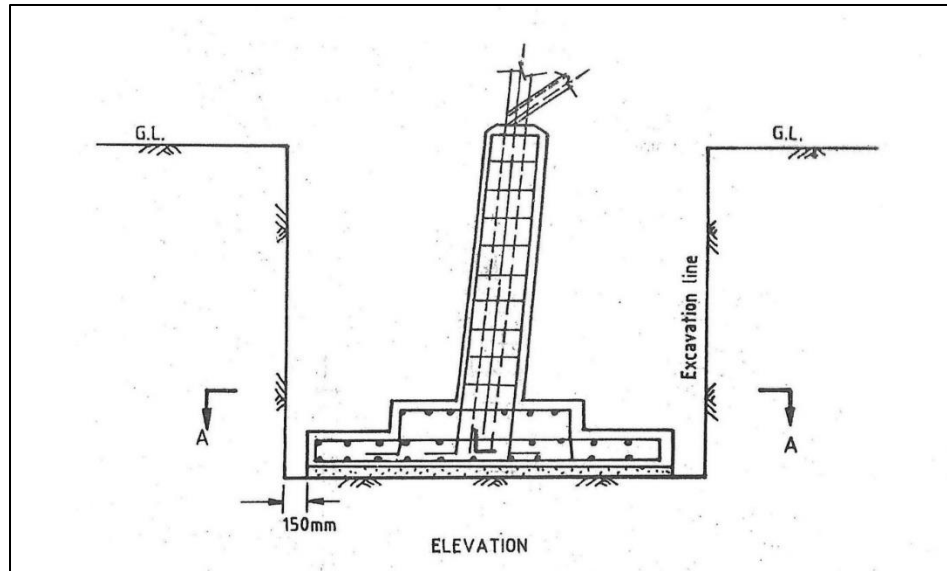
(a): Reinforced Concrete Spread Foundation with working clearance
